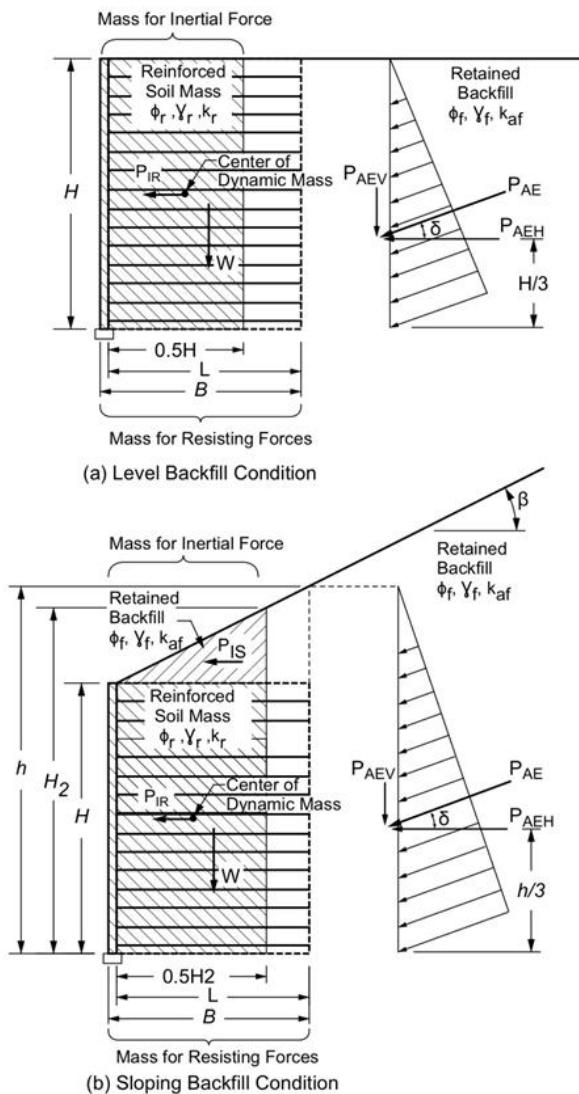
Seismic External Stability of an MSE Wall
